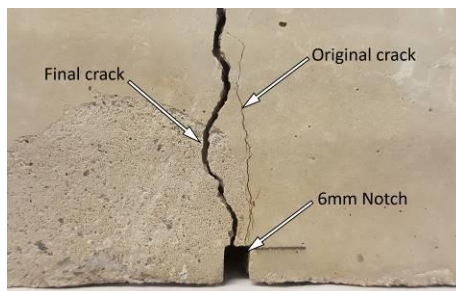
Original cracks and new crack formation on side face of Self-Healing beam
